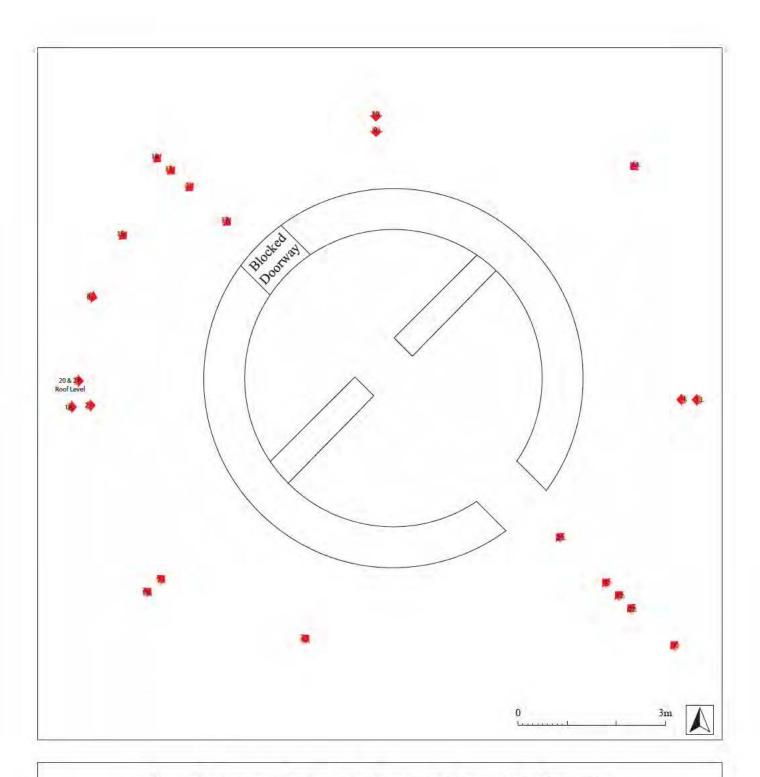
Location Plan Showing Photograph Positions for Plates 1 - 23
